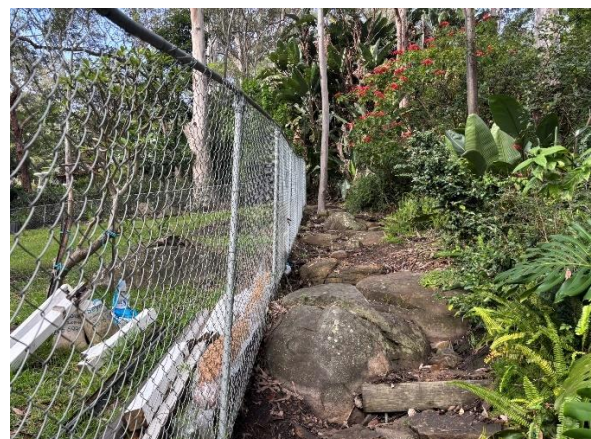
View of the terrace retaining wall showing signs of rotation, facing northwest
